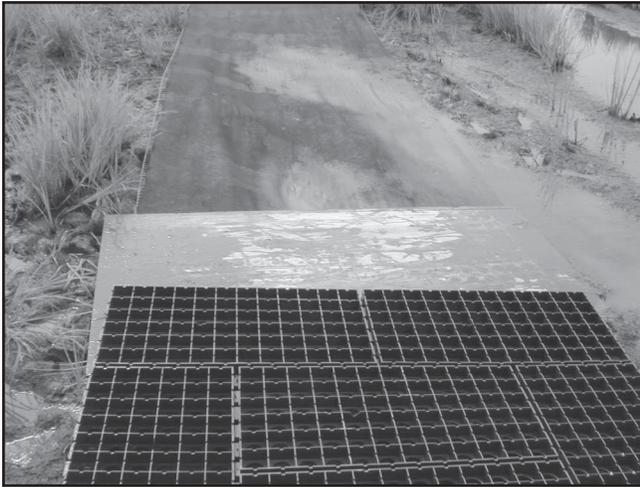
A 1/2-inch sheet of CDX plywood should be placed at section joints to provide a flat surface to help join the panels.
